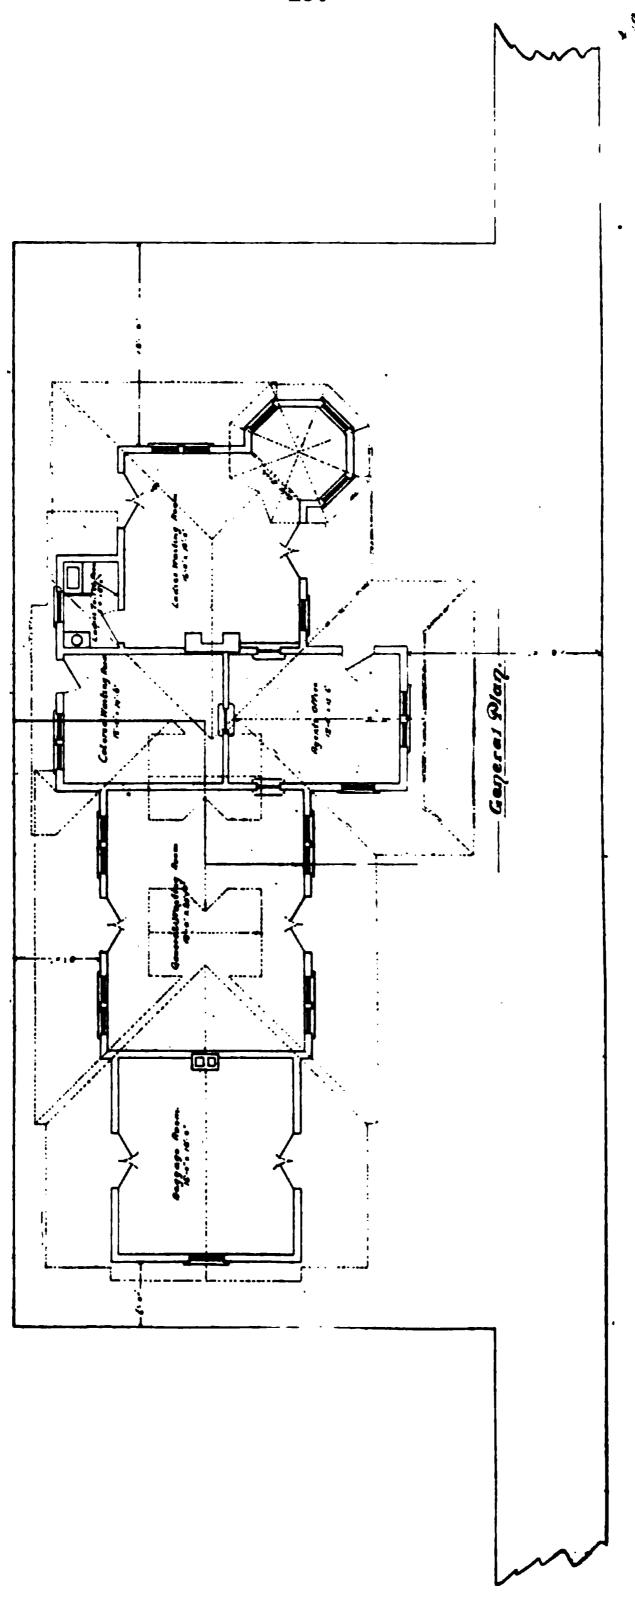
Floor Plan of Local Passenger Depot at Richmond, Ky., Louisville and Nashville Railroad. (Plan Nos. 18 and 19, Committee Report on "Local Stations.")
